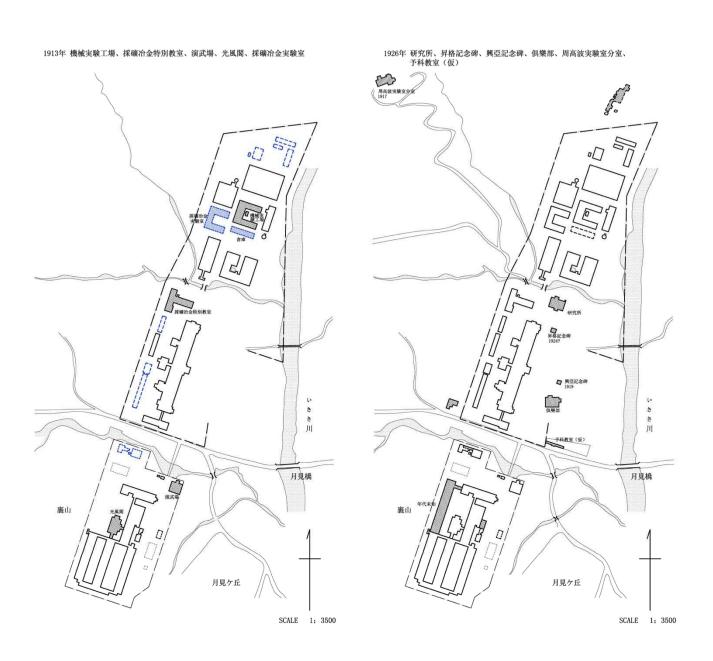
Retraced Campus Site plans of the RCE before 1945
